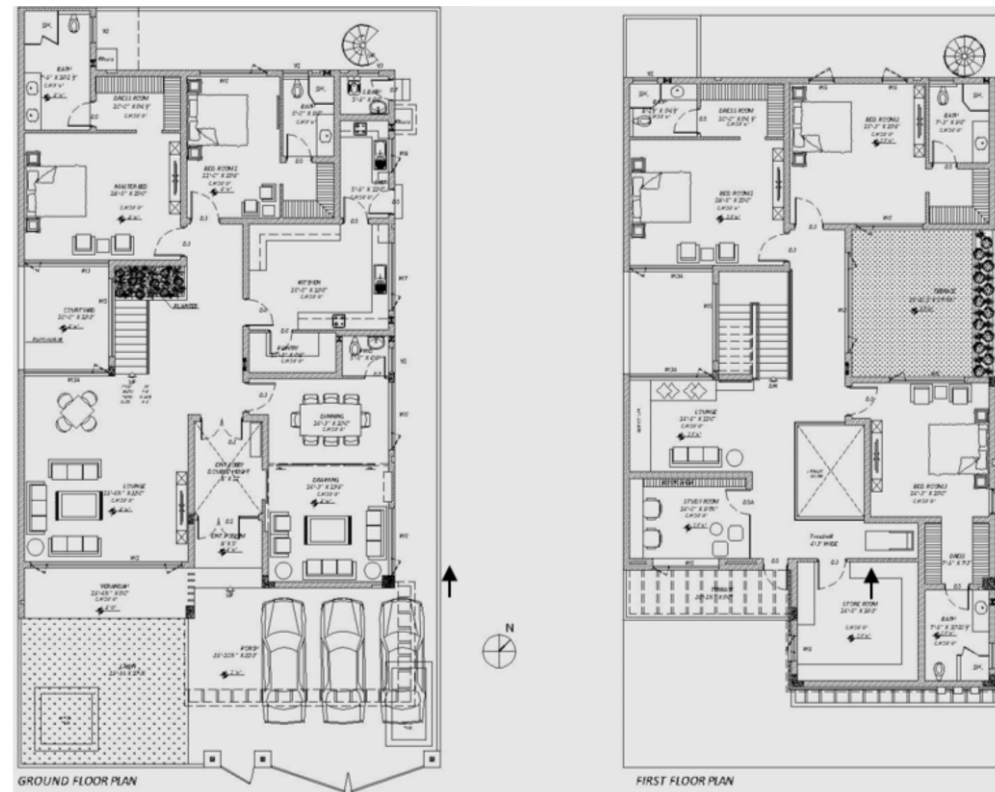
House A (a) Ground Floor Plan, (b) First Floor Plan,
